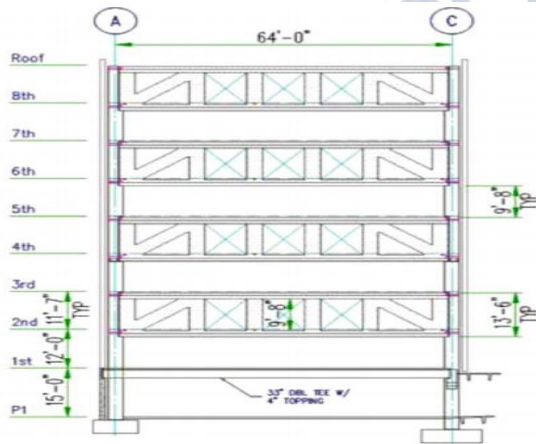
3 Erection of ER-POST trusses (Trygestad and DeSutter 2007)
